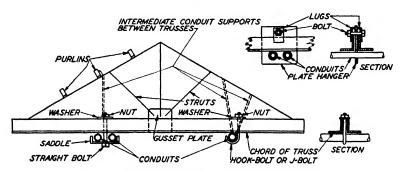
Method of Attaching Conduit to Steel Roof Truss
